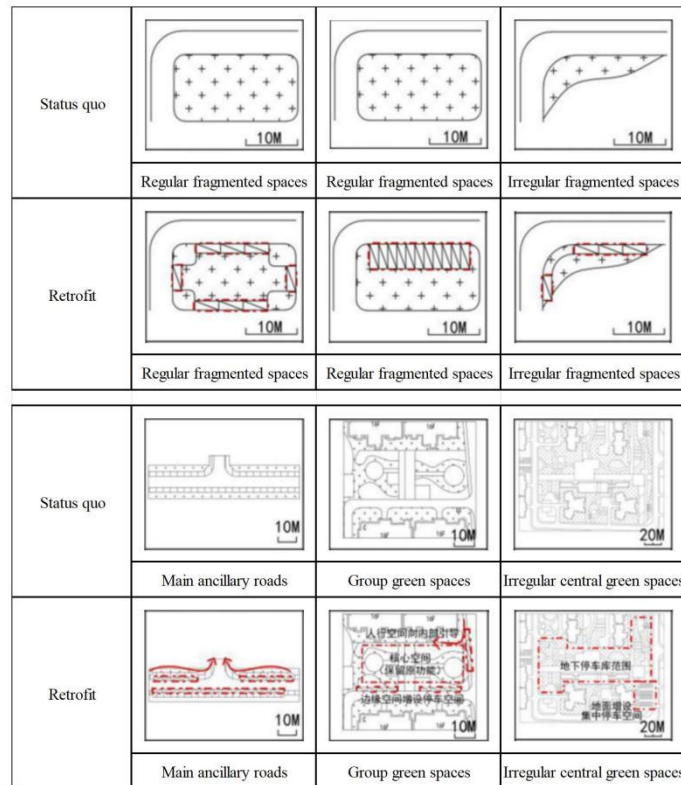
The renovation strategy plan of the first type of Shared Integration Degree space
